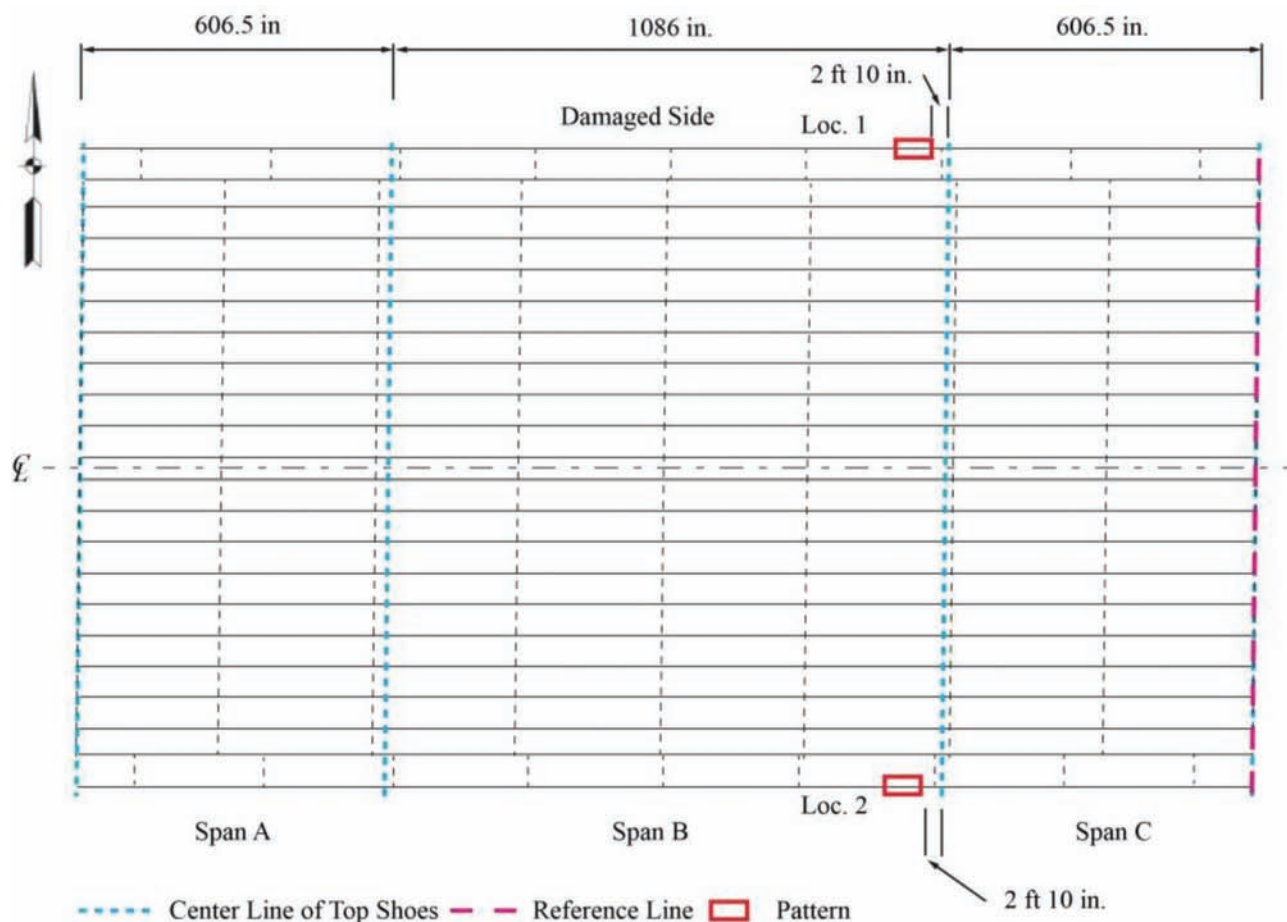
Framing plan and pattern locations for Asset 020-71-04052.
